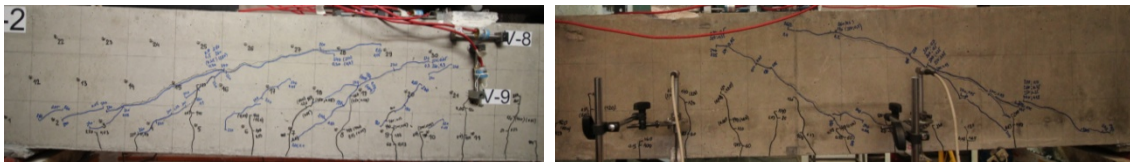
Crack pattern in a) the front side and b) the back side of the HVFAC-2 beam prior to failure
